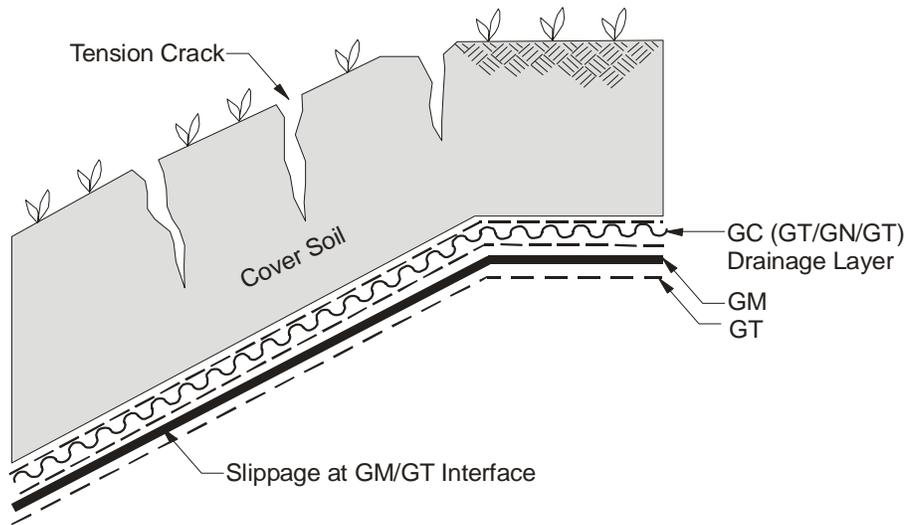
Failed Surface-Water Runoff Control System for Another Portion of the Closed MSW Landfill Located at an Arid Climate Site and Shown in Figure 7-18.
